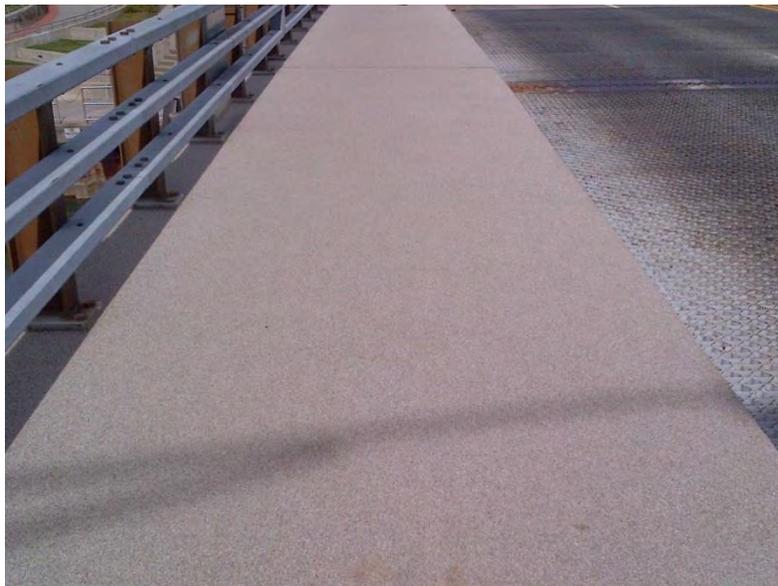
Concrete Filled Steel Grid with Wearing Surface
